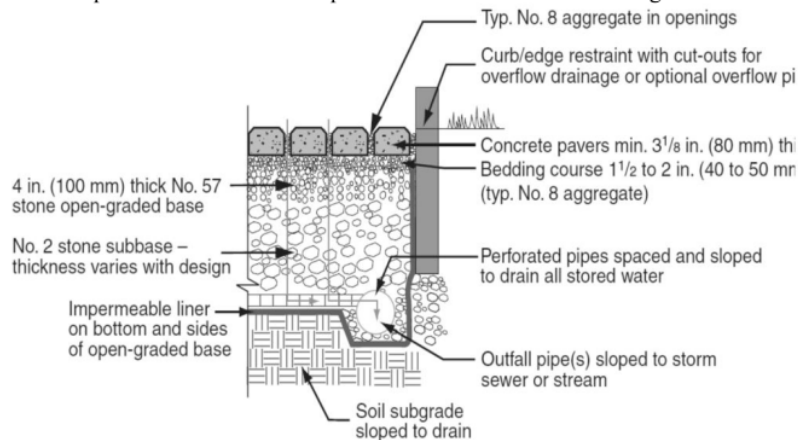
Typical Partial Exfiltration Structure at Permeable Pavement (Smith, 2005)
